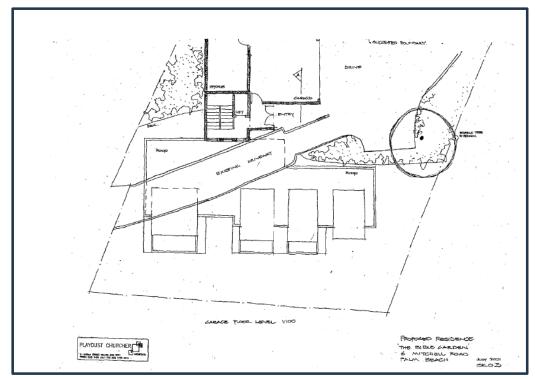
Concept Architectural Plans Detailing location of Garage on southern portion of 6 Mitchell Road (Source: Heads of Agreement Contract 2004)
